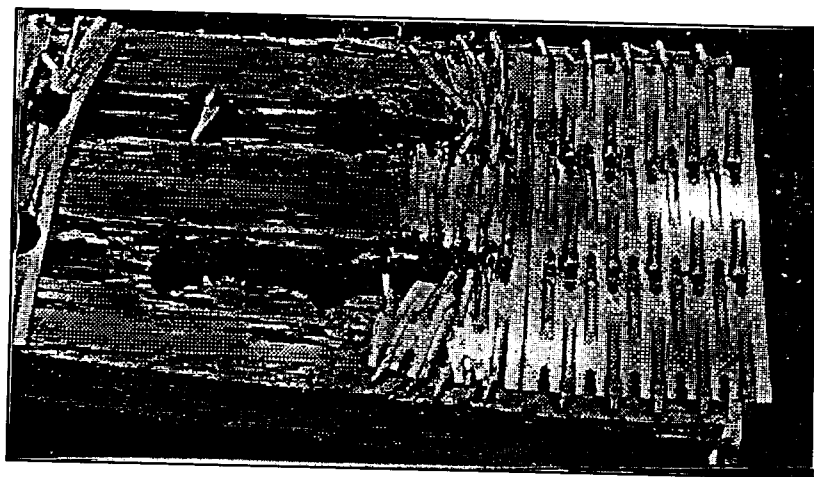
Row shear-out failure of 1/2" truss plate reinforced PSL specimen tested in reverse cyclic loading
